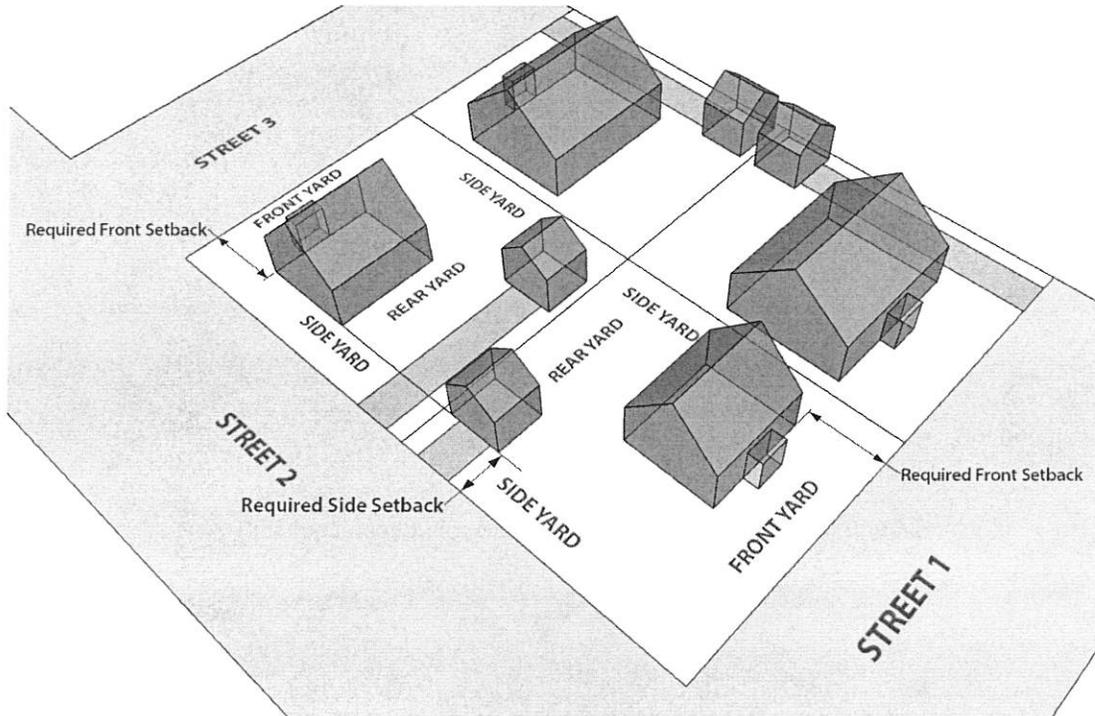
Accessory Building Location for Corner Lots with Side-Side Yard Situations
